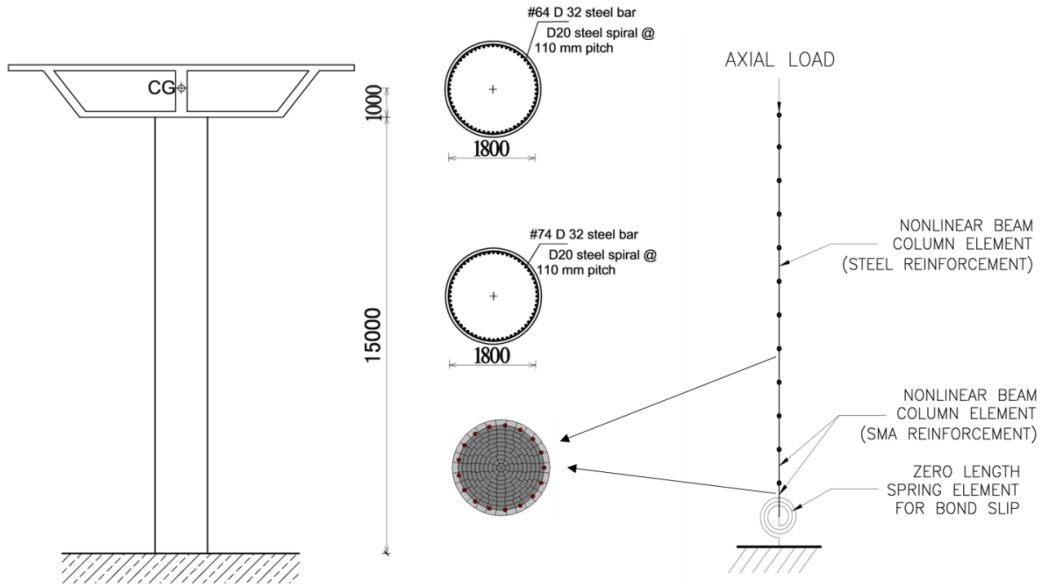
Geometrical detail and numerical model of the bridge pier (dimension in mm).
